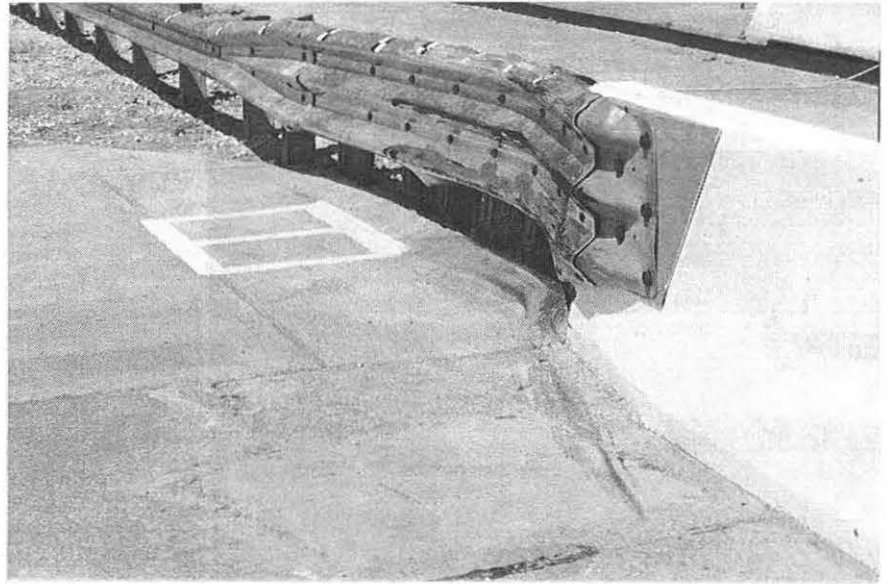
Barrier Damage, Test ITNJ-1 (Design No. 1)
